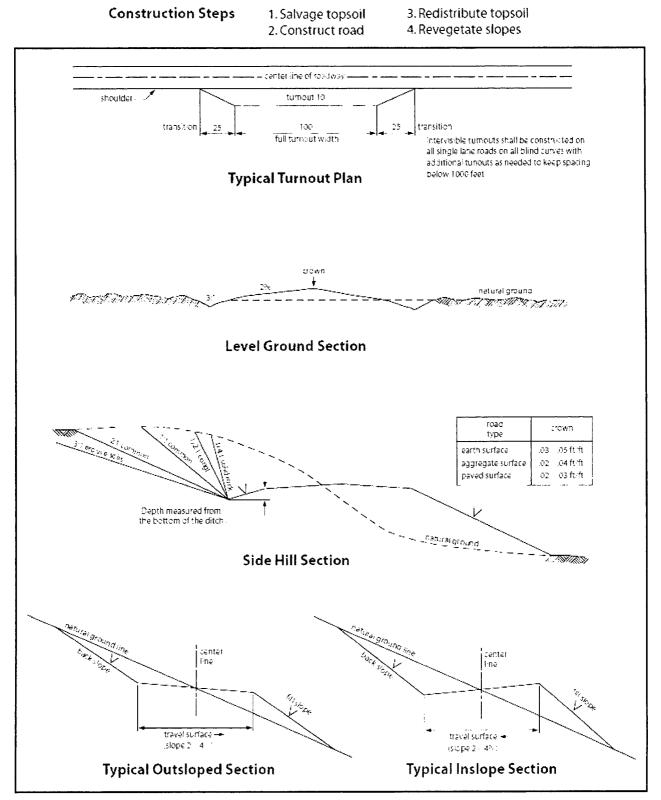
Cross-sections and plans for typical road sections representative of BLM resource or FS local and higher-class roads.
